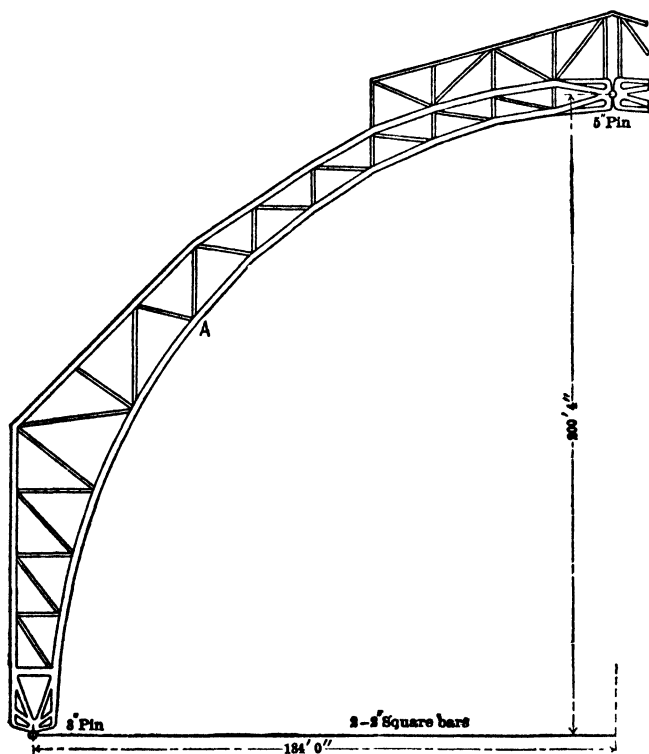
Three-hinged Arch, Manufactures and Liberal Arts Building, Chicago Exposition
